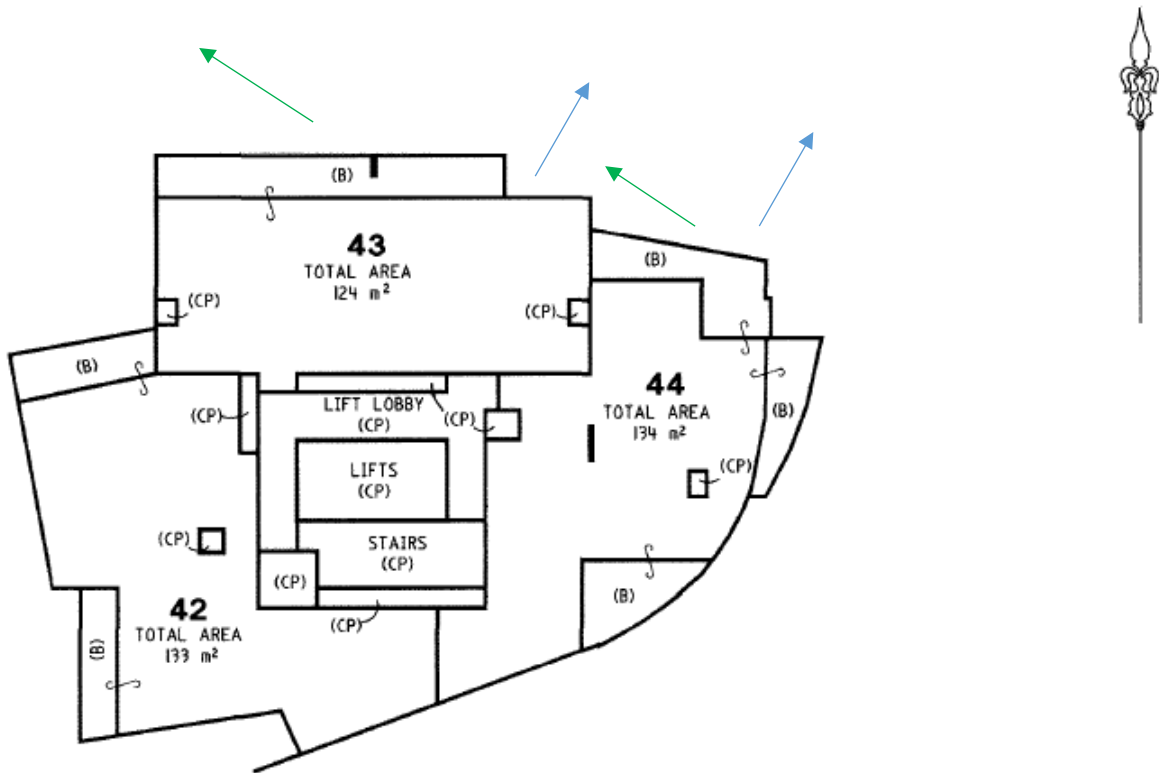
Strata Plan layout of Level 9, at 417-419 Bourke Street, Surry Hills
